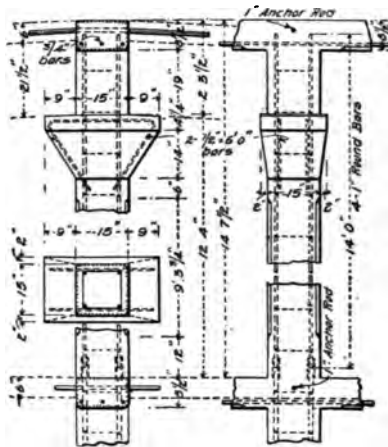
Column with Brackets to Support Separately-Molded Visintine Girders.
